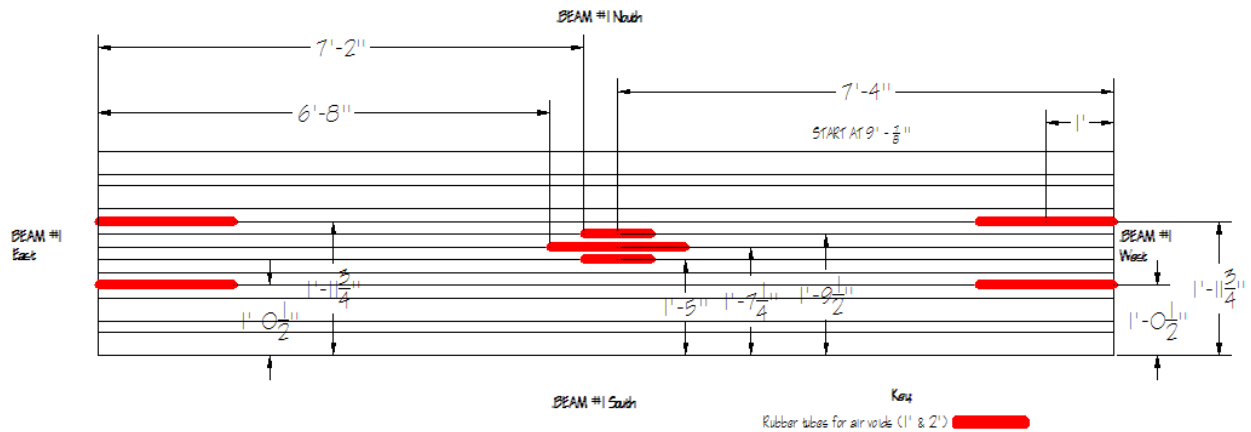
Bottom Plan of Box Beam 1 showing locations of defects around strands
